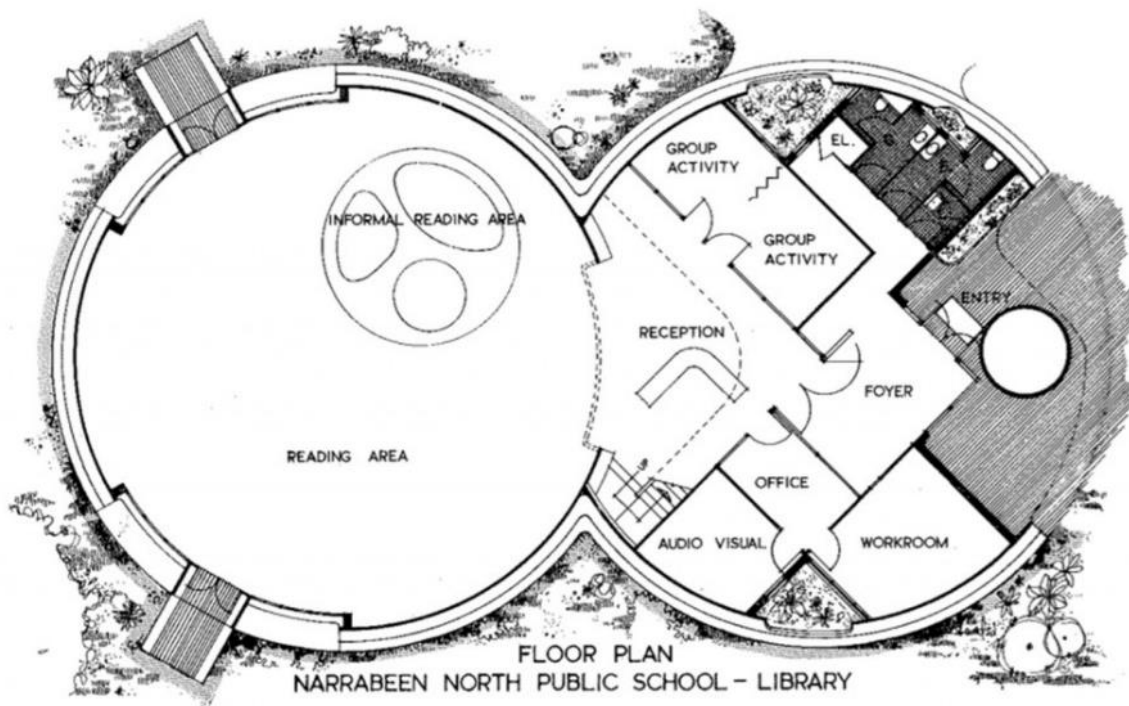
NARRABEEN NORTH PRIMARY SCHOOL LIBRARY, FLOOR PLAN 1974 (BINISHELL B).
